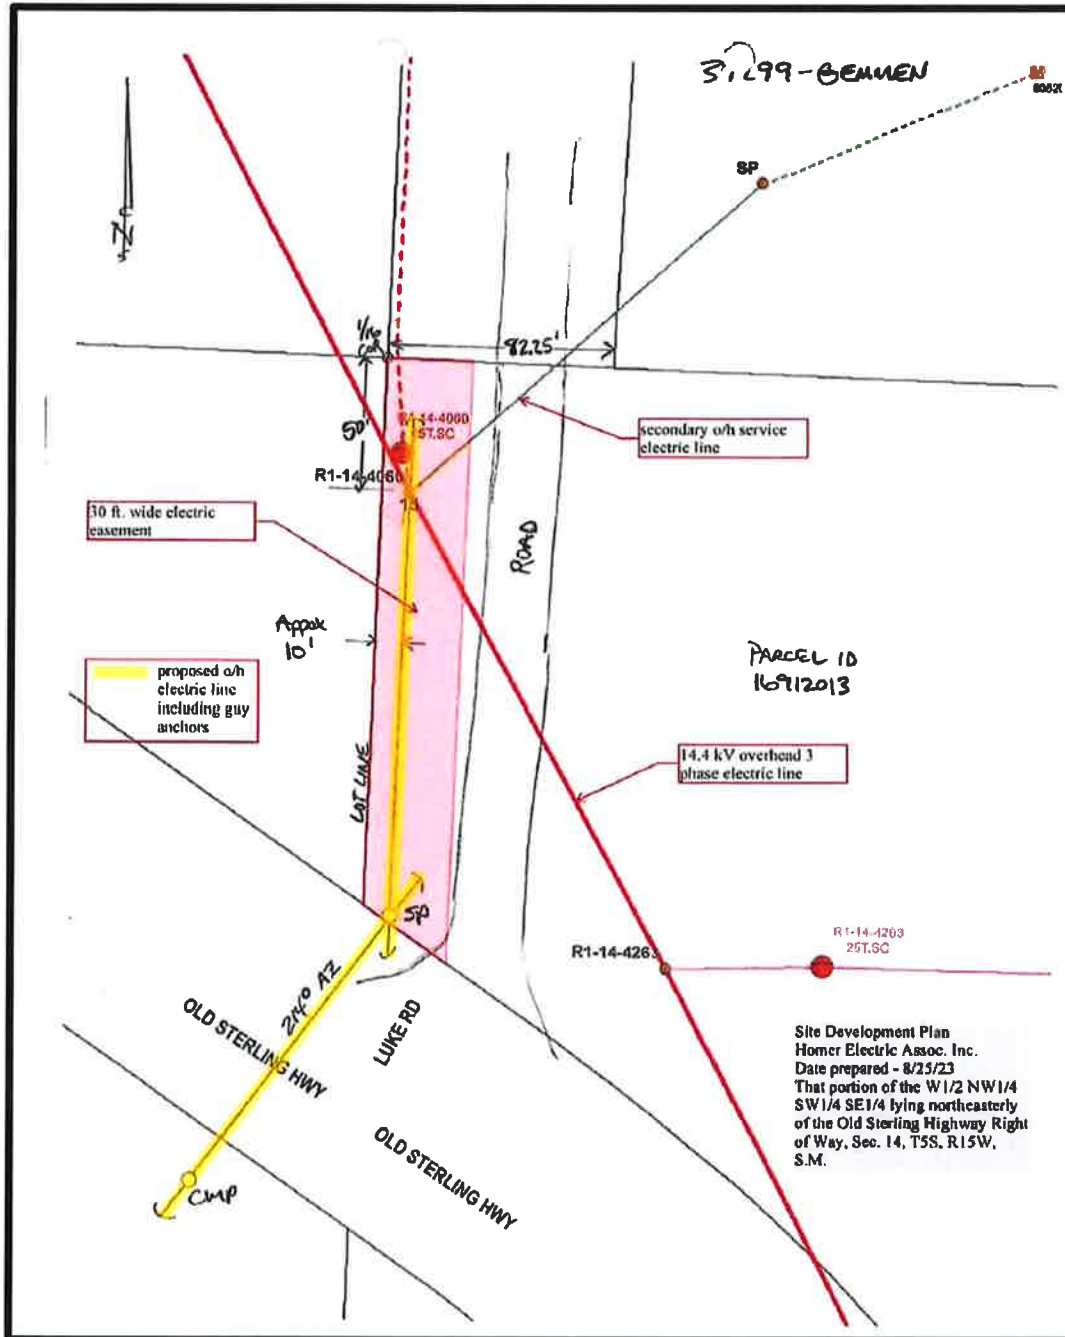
An applicant-provided depiction of the proposed electrical line easement
